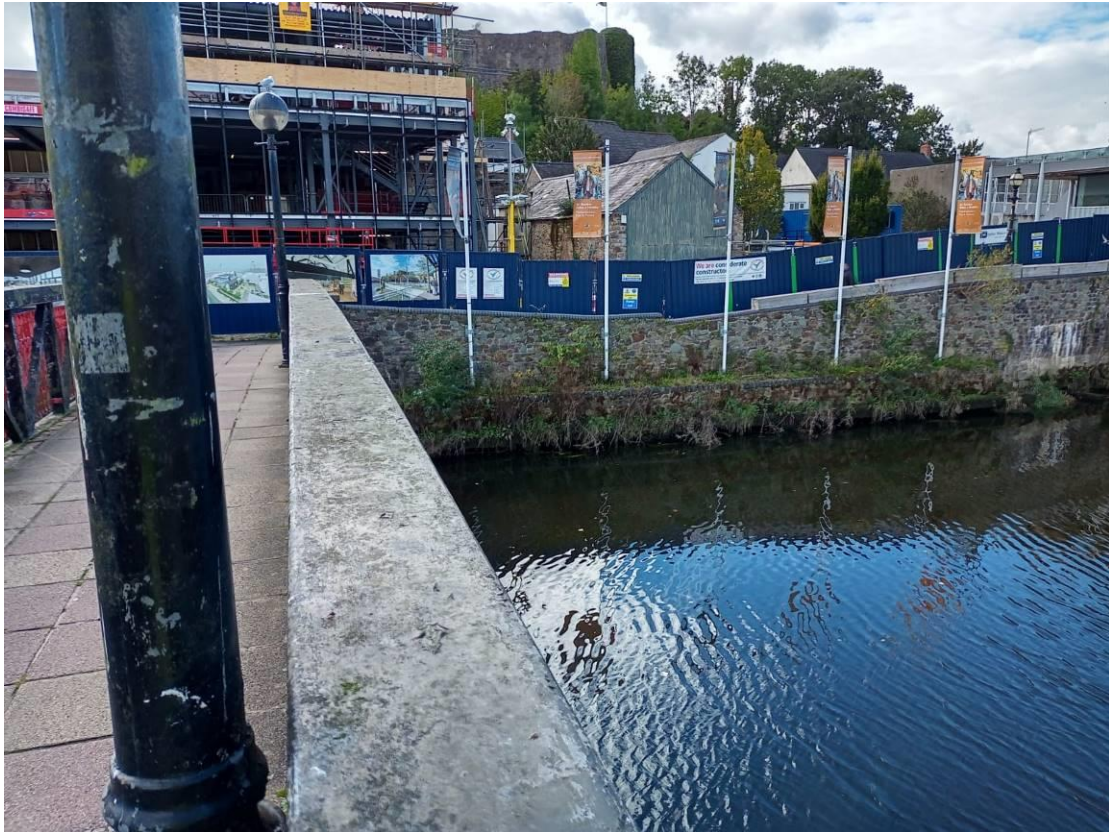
View of the western bank to the north of the current footbridge, as seen from the footbridge. Looking west.
